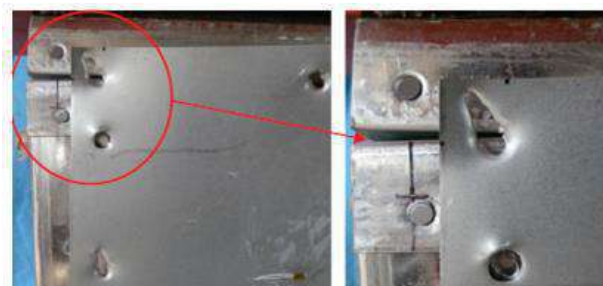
a) Real products. b) Failure mechanisms of SPR connections in walls.
